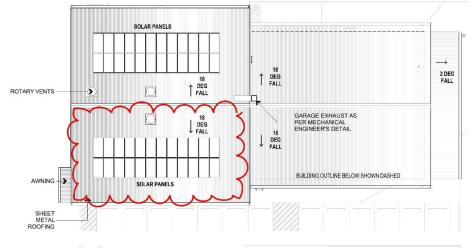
A: Roof Plan of relocation of solar panels to roof – s.4.55 Modification (source: F&J Tepa)
